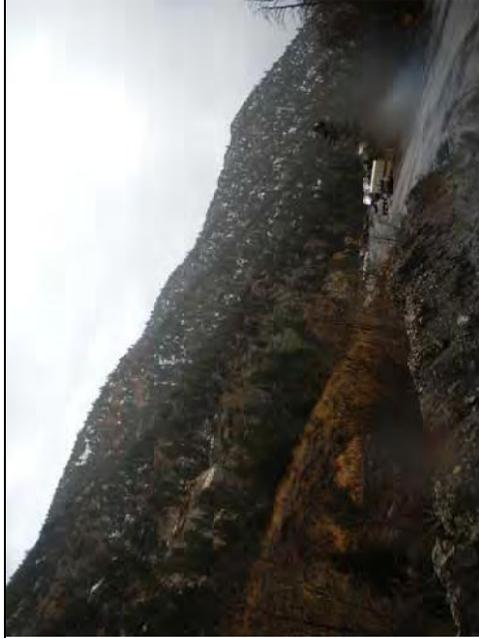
TS 3 Sta 8+00 Plate 2-3C
